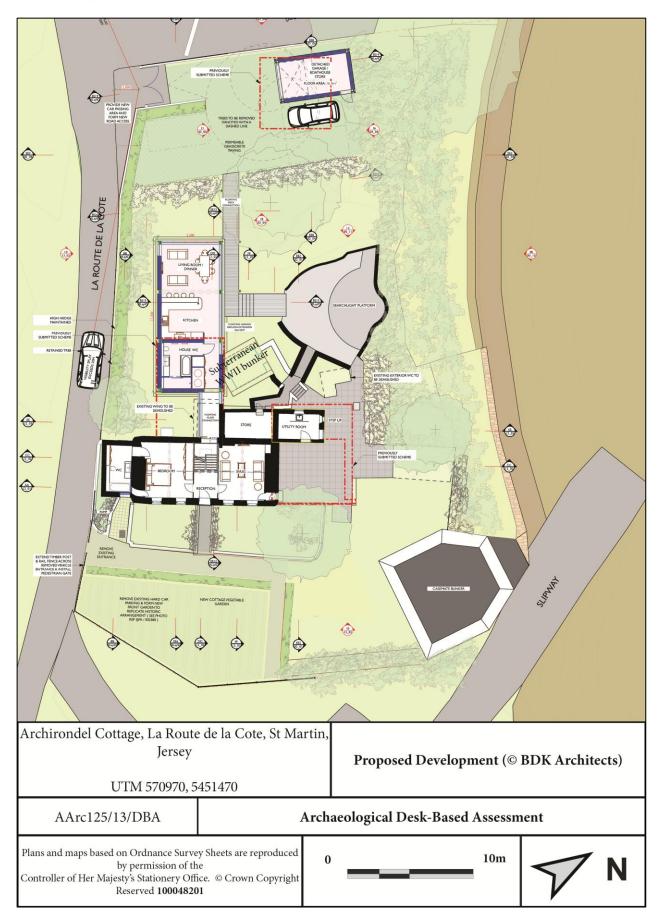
Proposed Development (the columns supporting the extension are marked in green and are not currently positioned over the bunker, ensuring its integrity) – please refer to formal drawing submitted with the application by BDK Architects for detail.
